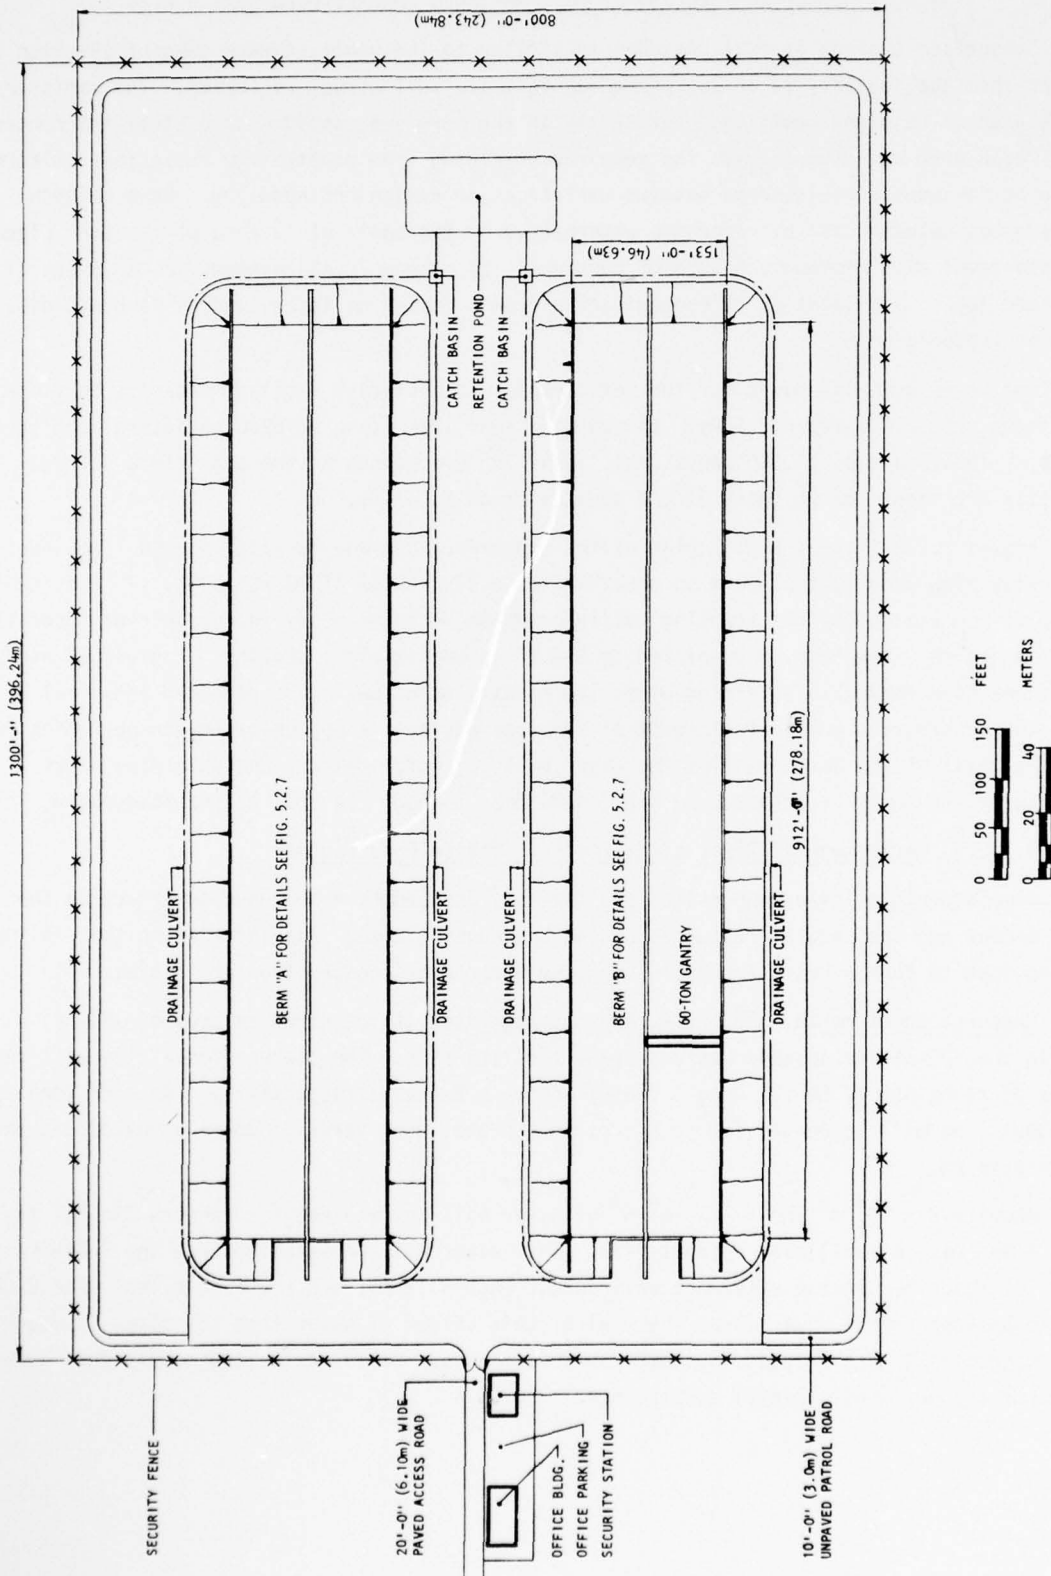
Plot Plan of the Subsurface Storage Facility for Fuel Residues
